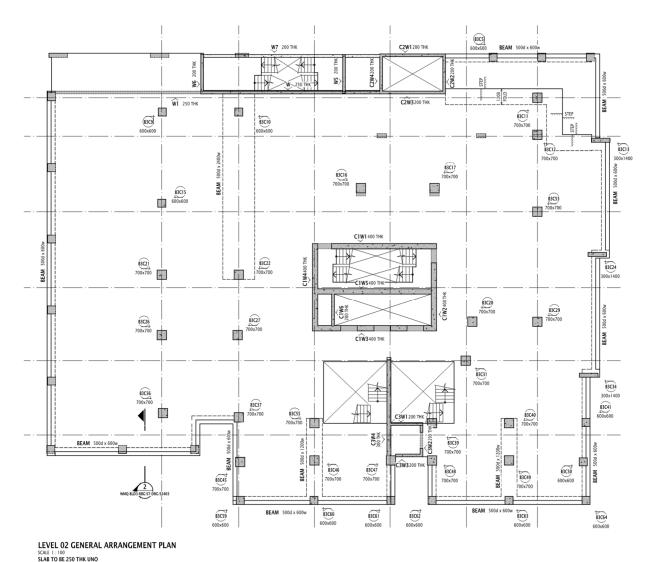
Level 2 Slab Plan (Level 1 & 3 similar
